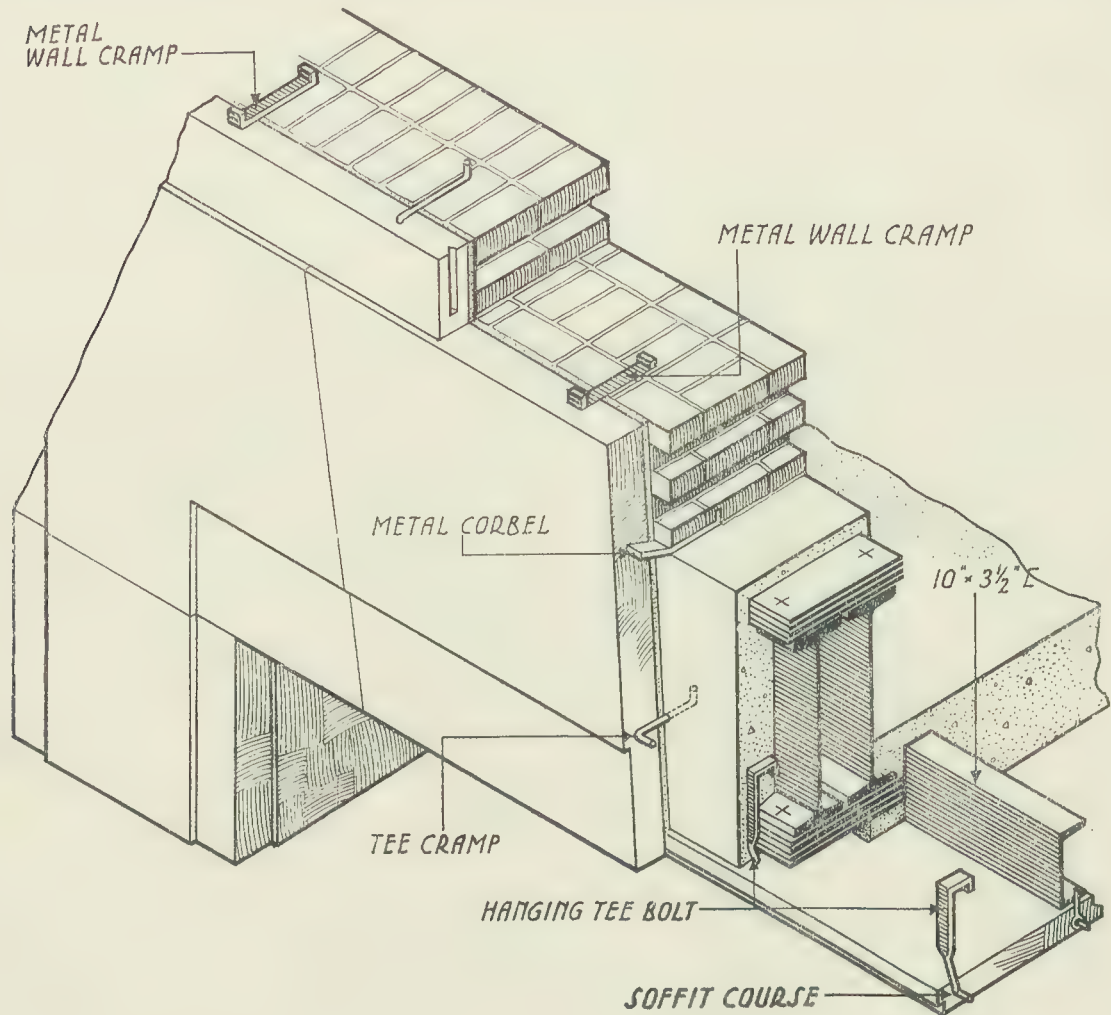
BRICK WALL FACED WITH STONE SLABS
